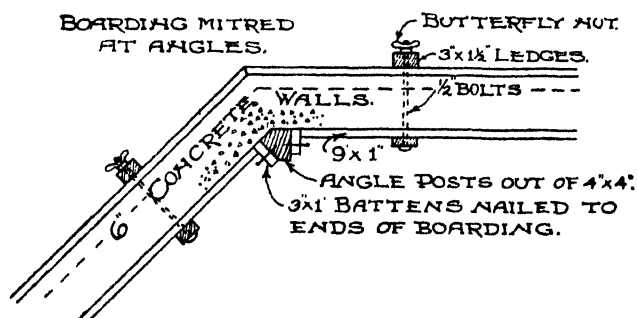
Detail Plan of Corner of Octagonal Concrete Silo, showing Forms.
